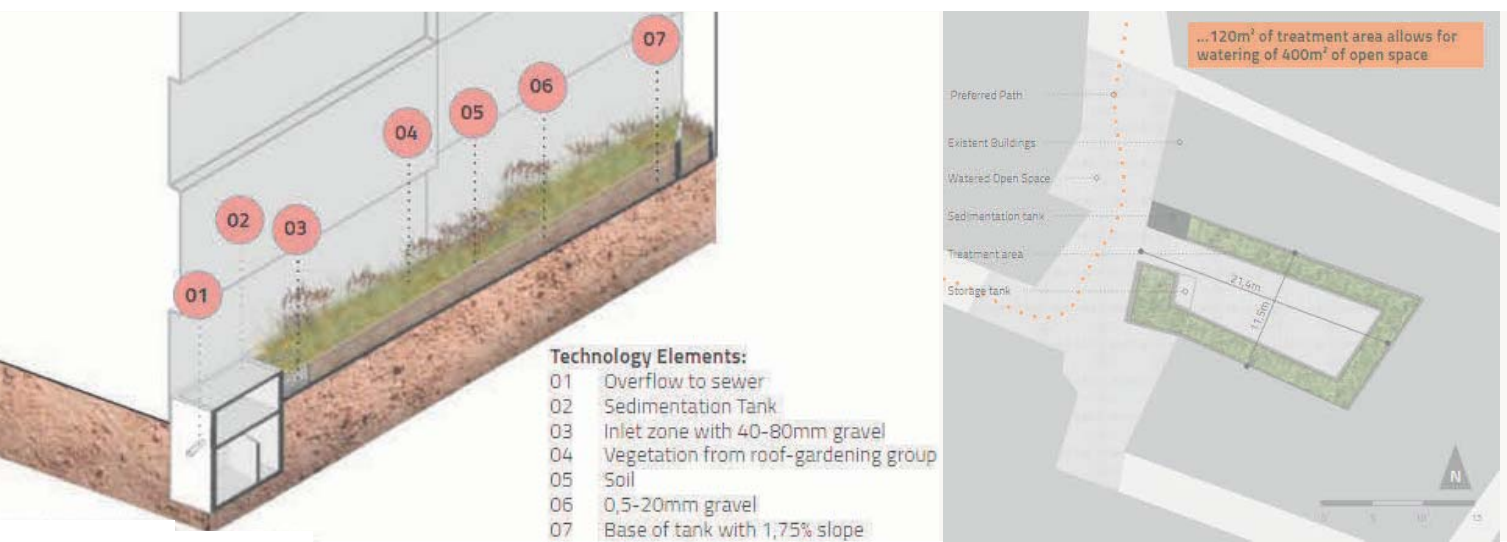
Cross section (left) and plan (right) of the constructed wetland for the pilot project
